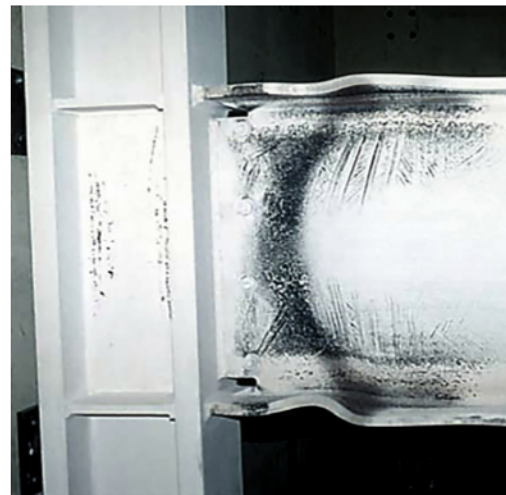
Plastic Hinge in Beam Element for Typical SMF Connection
